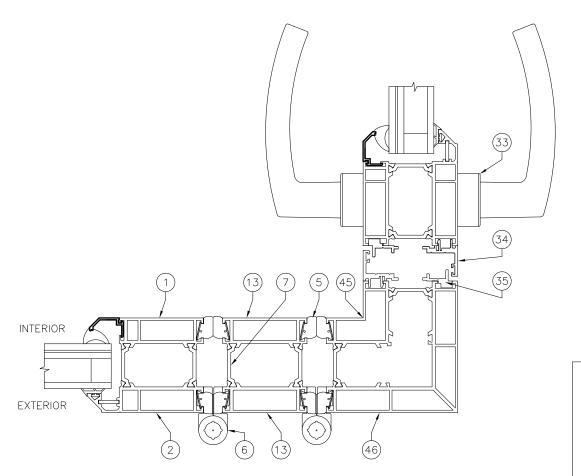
OPEN-OUT LOCKING MEETING STILES, REVERSE PARTS 34 AND 35 FOR OPEN-IN
